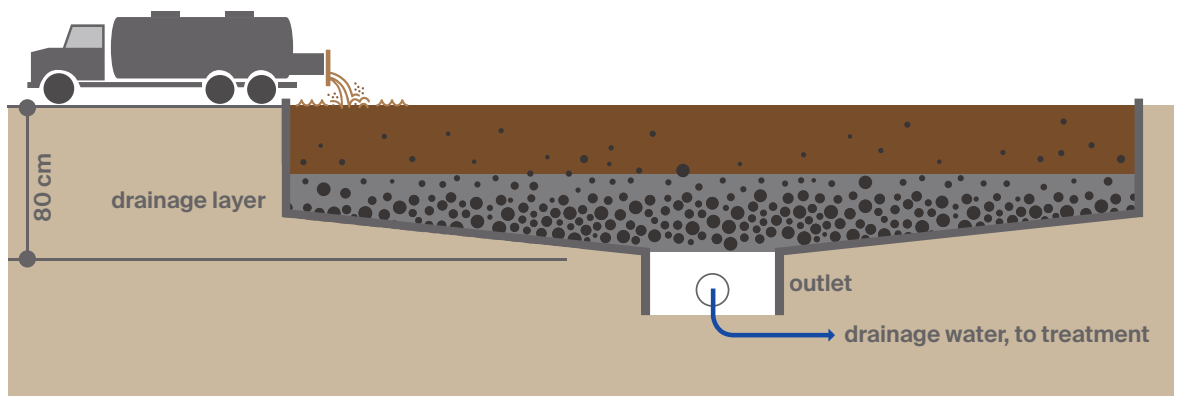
Section view of an unplanted sludge drying bed (adapted from Tilley, et al., 2014)
